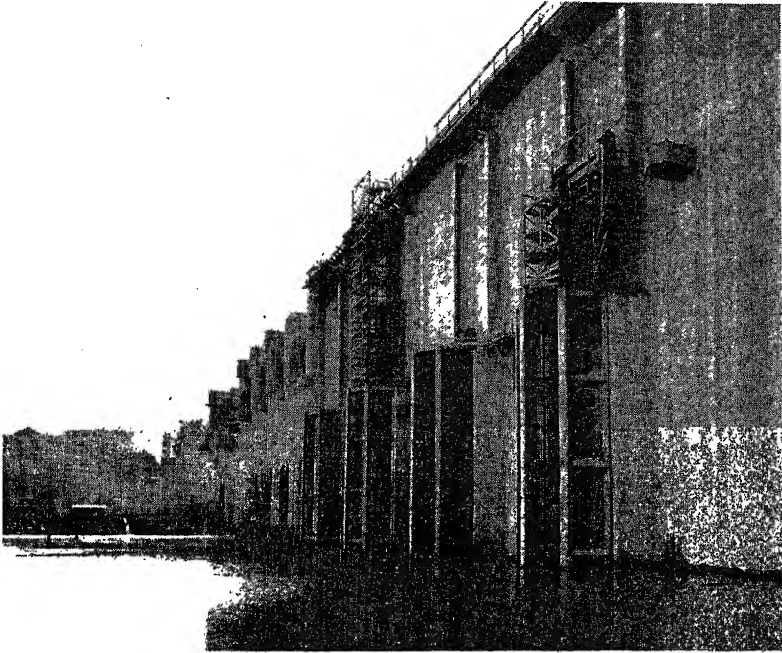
Intake gate assembly on deck of trashrack structure.
